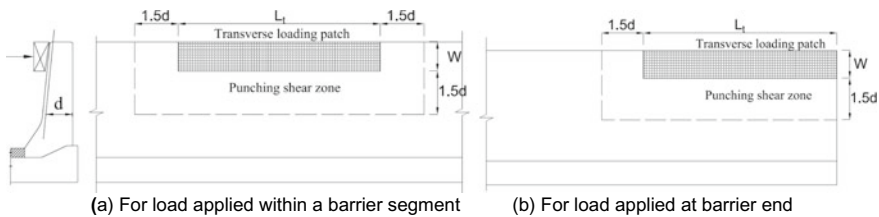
Critical perimeter of punching shear failure in concrete barrier walls
